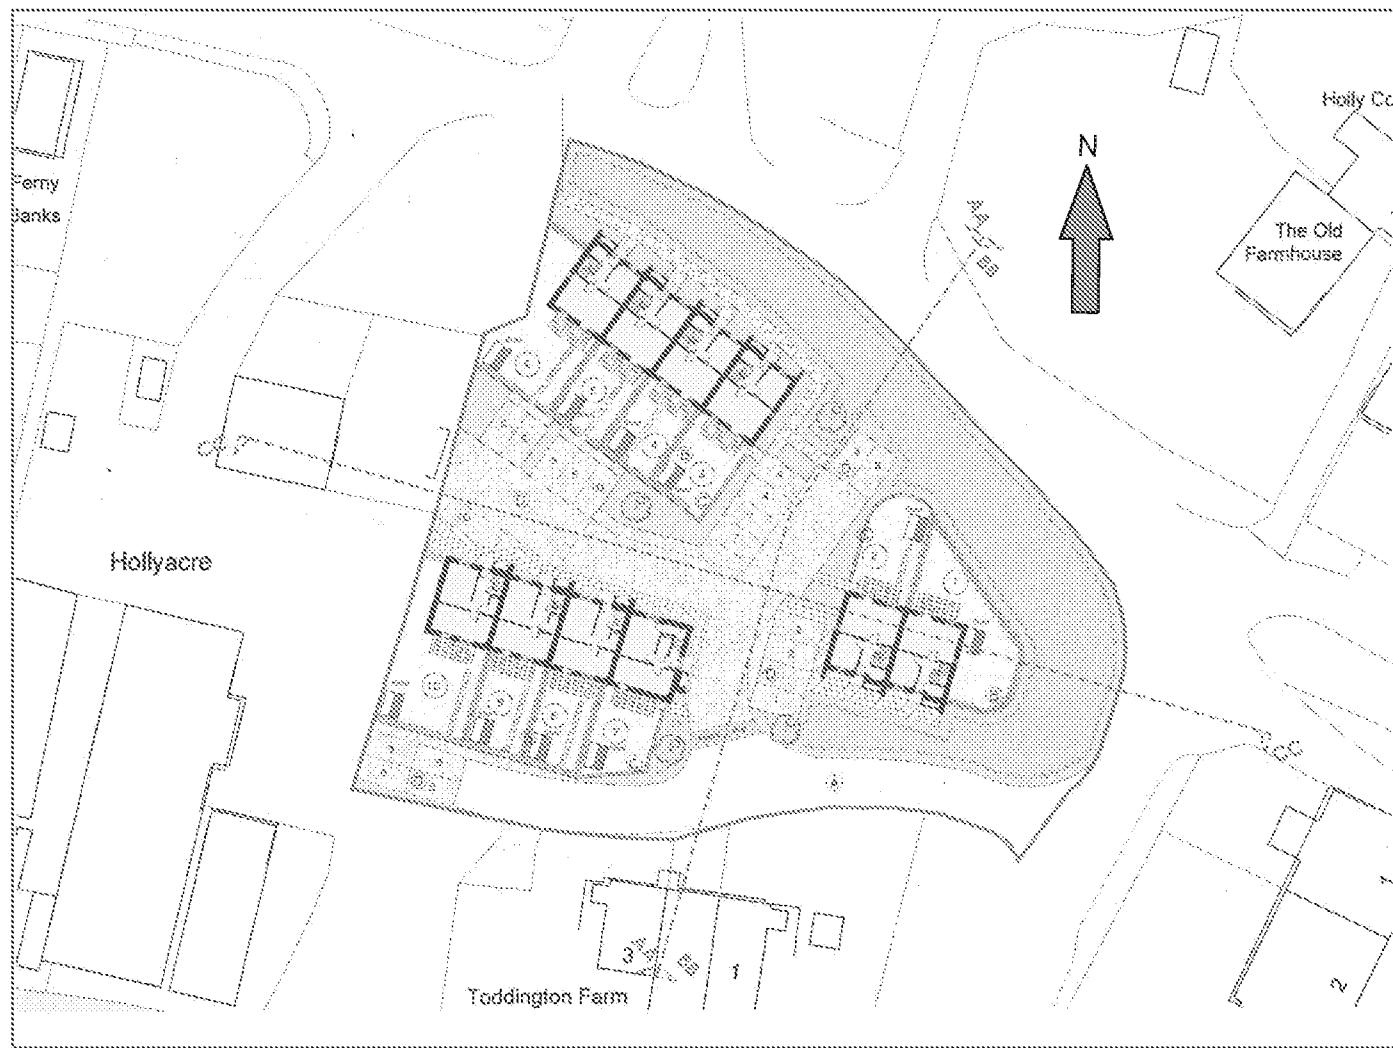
Block plan showing the proposed layout of the development site at an original scale of 1:200 at A1, (extract from Architects plan).
